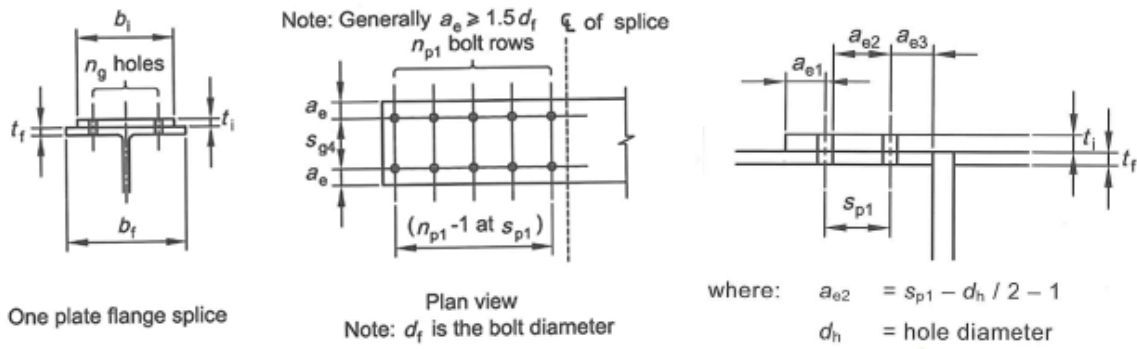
Definition of geometry of flange splice plates (Connection Design Guide 13)
